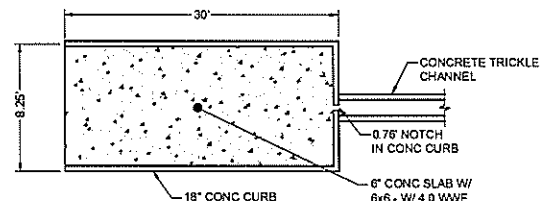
TYPICAL OUTLET STRUCTURE
